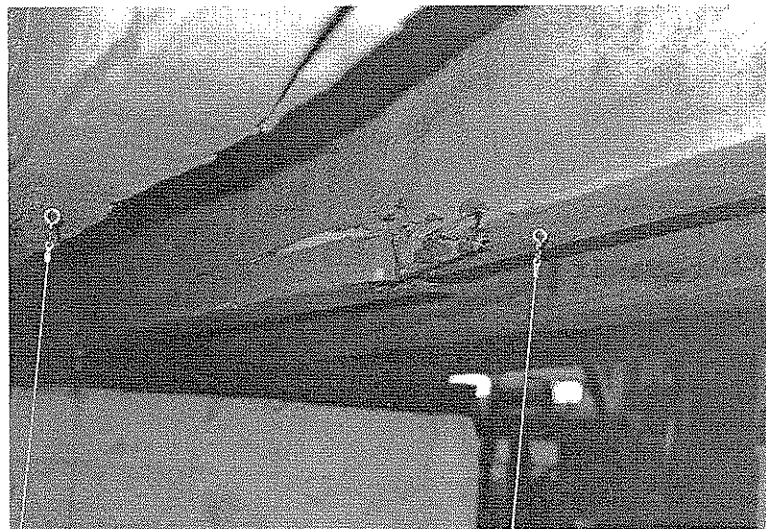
Stringer 3M failure at knot location in tension face - Bridge 2.
